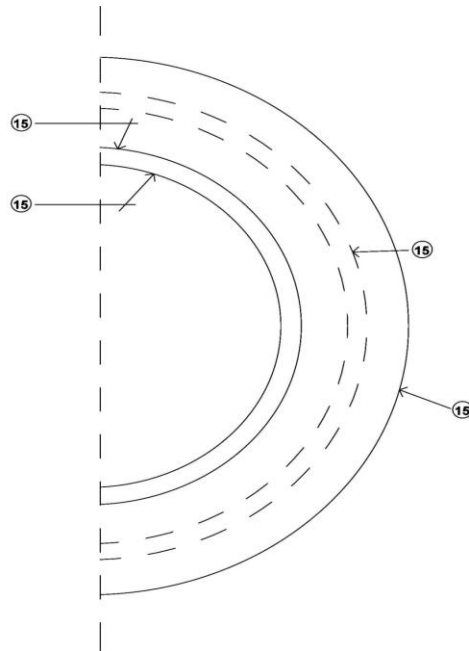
Earth Foundation with (R.C.R.W) Plan
